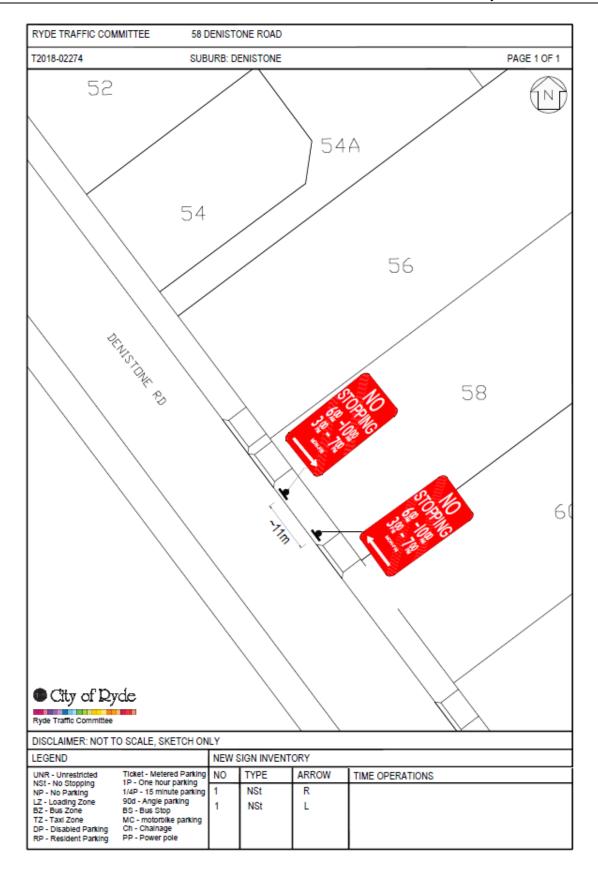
Proposed No Stopping outside 58 Denistone Rd, Denistone
